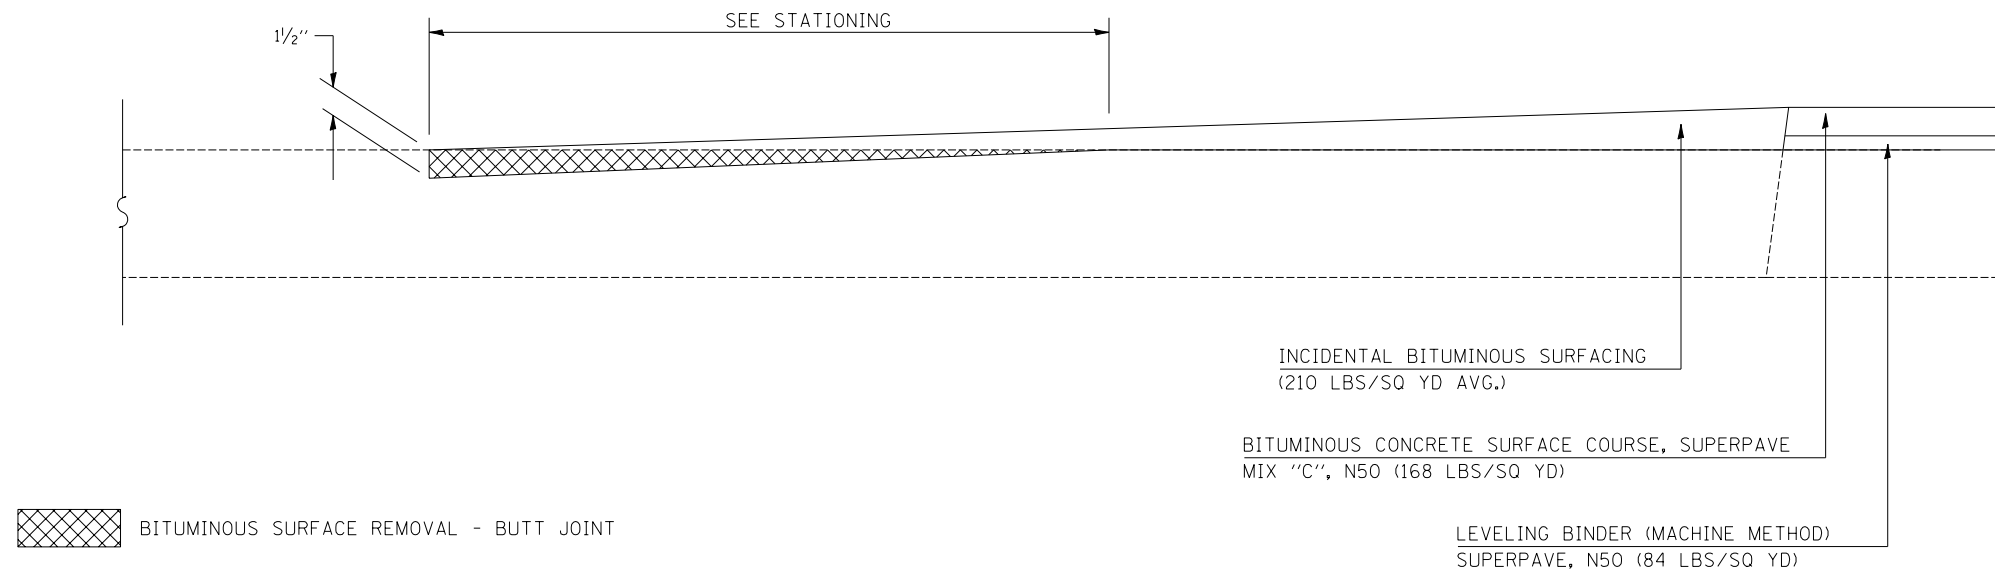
DETAIL OF BITUMINOUS SURFACE REMOVAL - BUTT JOINT
